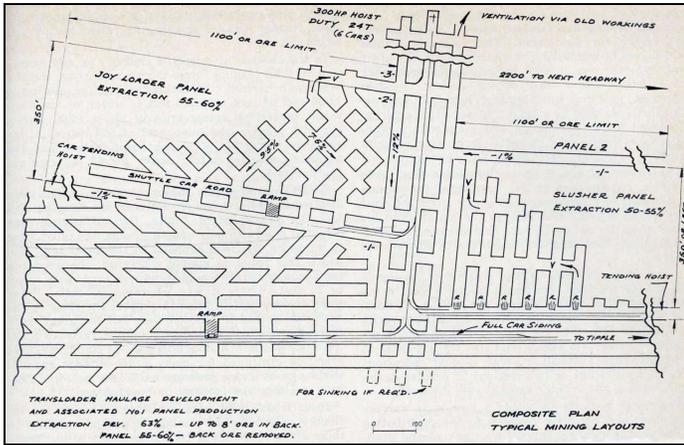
Composite plan of mining layout for No. 3 mine (Southey 1969).
